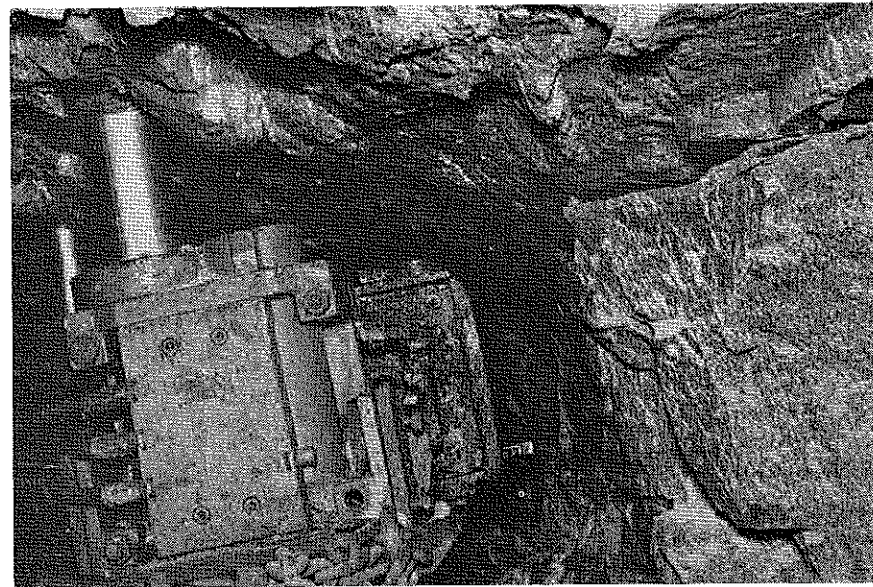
Close-up View of the Cutter Head. Note that only one cutter is being used. Doornfontein Gold Mine, South Africa.
